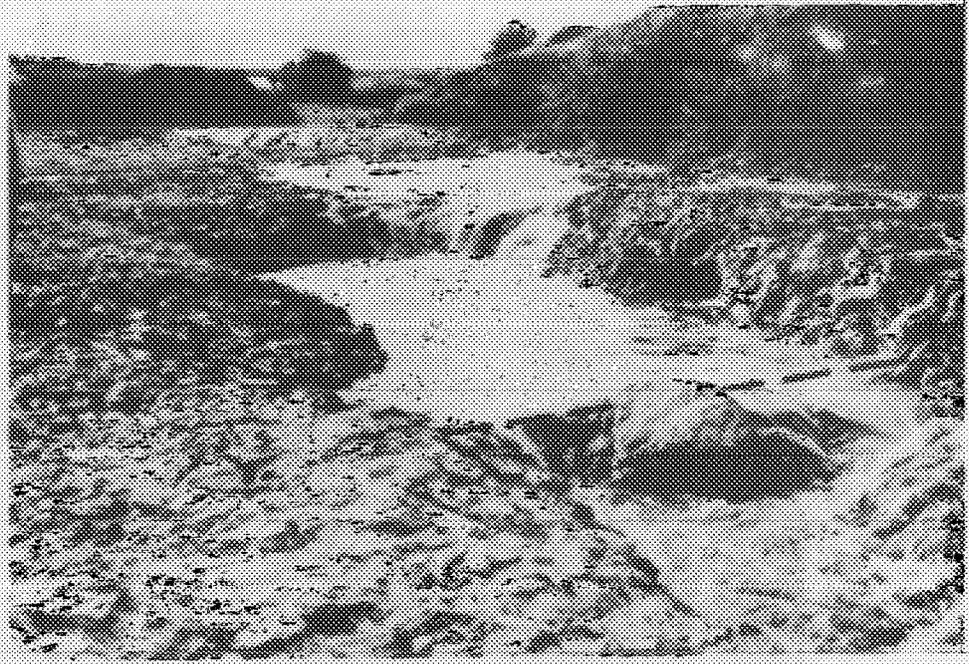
WEIR NO. 2 STA. 116+25 PRIOR TO CONSTRUCTION
